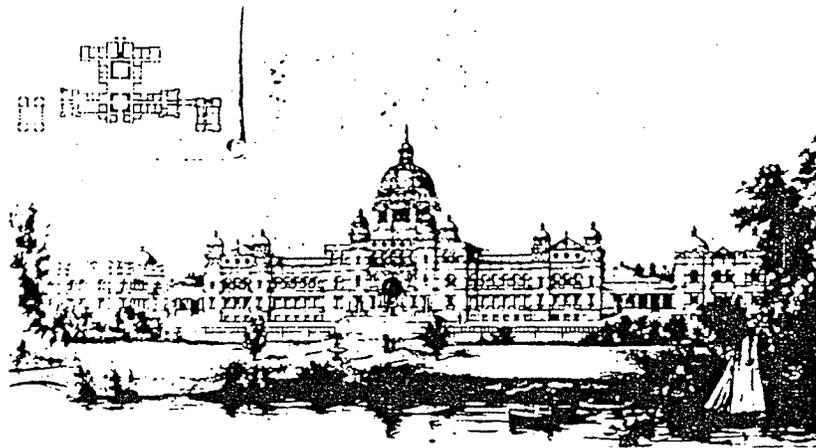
B. C. Legislative Building and Grounds, 1892.
